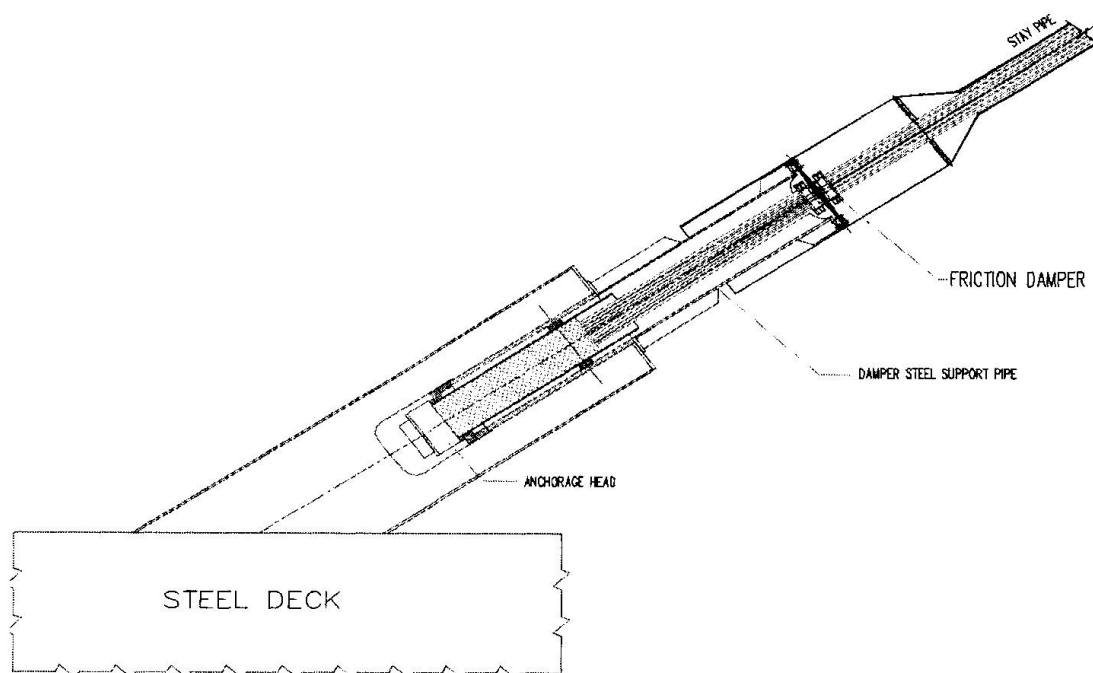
Installation of friction damper on UDDEVALLA Bridge
